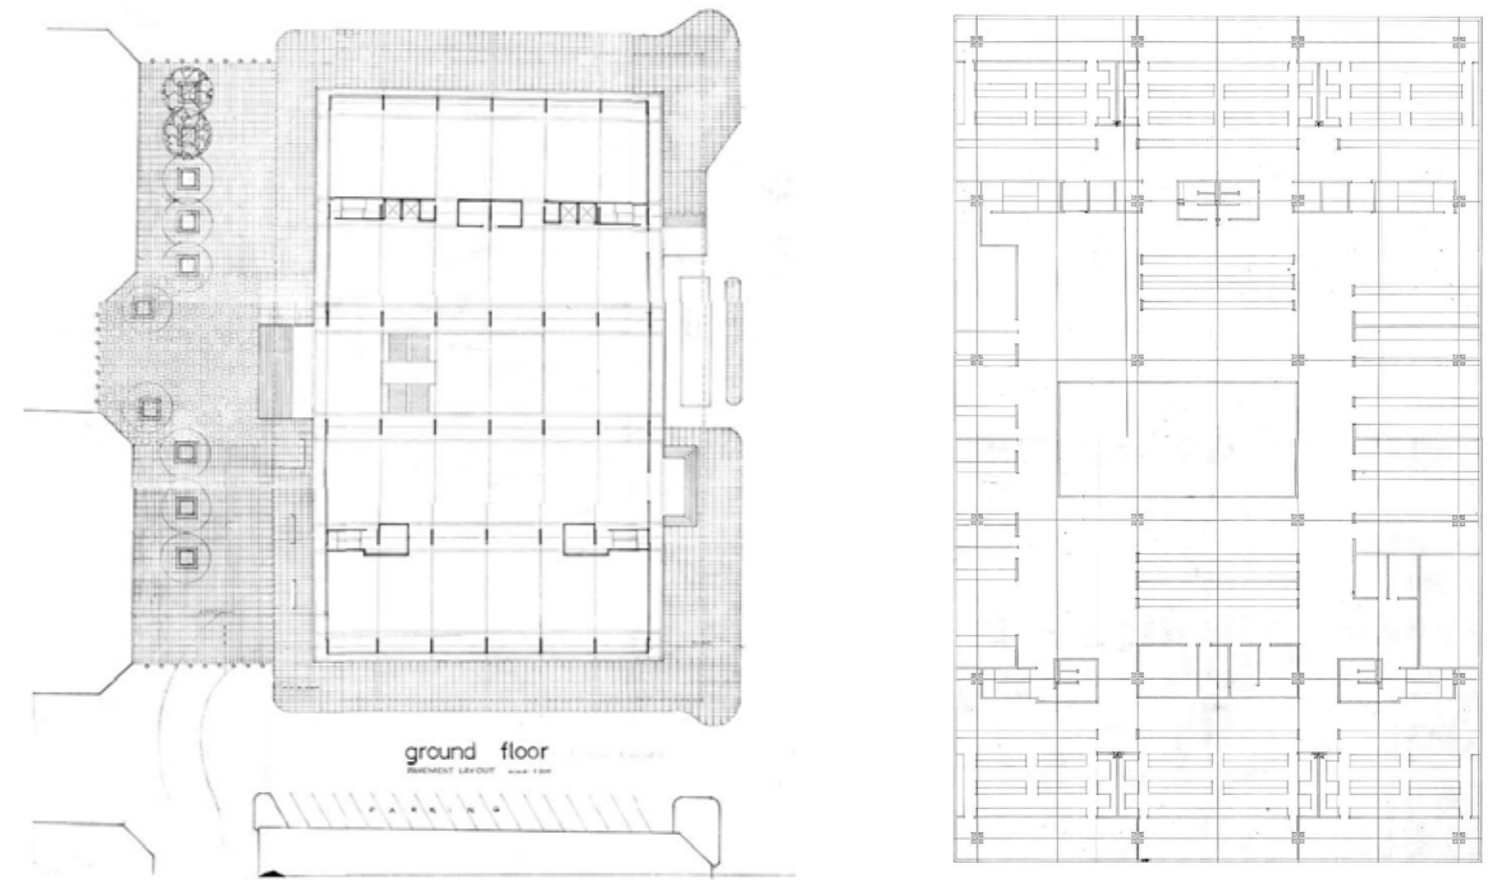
Ground floor (left), first floor (right) (Amani, 2022).
